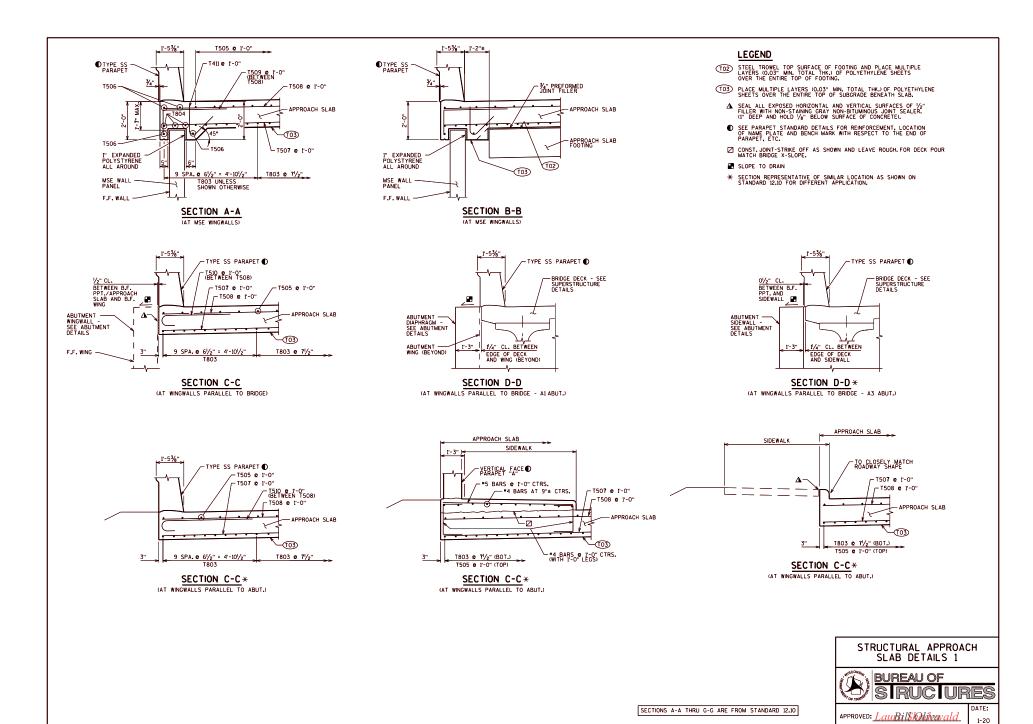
DETAILS FOR WINGS PARALLEL TO A1 ABUTMENT CENTERLINE
